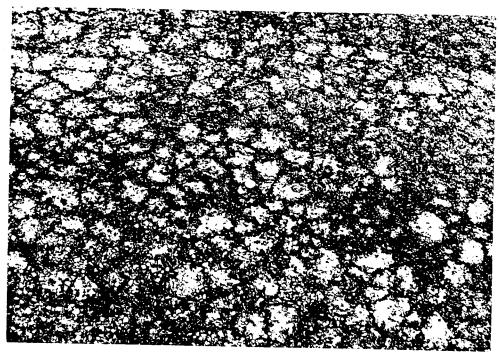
Inspection Photo taken April 1994 showing alligator cracking.
